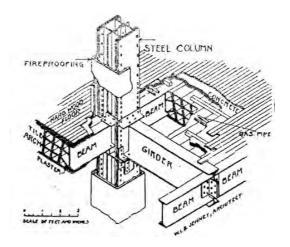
Jenney's detail drawing of fireproof steel-frame construction (Frampton, 1987, p. 52)
